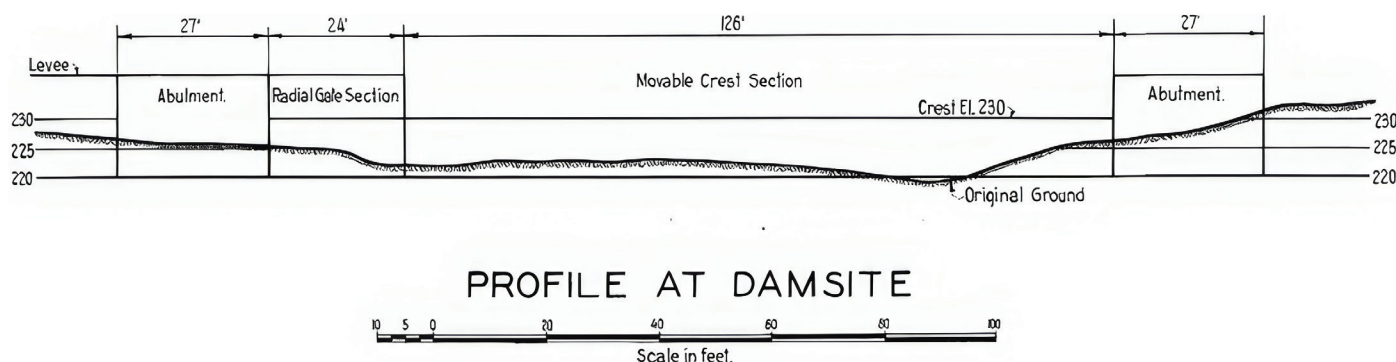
Engineer's drawing of Coyote Percolation Dam's site profile showing a levee, abutments, and the movable crest section, where the dam's flashboard would be positioned for water flow control. Fred H. Tibbetts, Santa Clara Valley Water Conservation District: Coyote Percolation Reservoir to Accompany Water Right Application, File No. 2023-84, May 1935 (on file at Valley Water's Archives).
